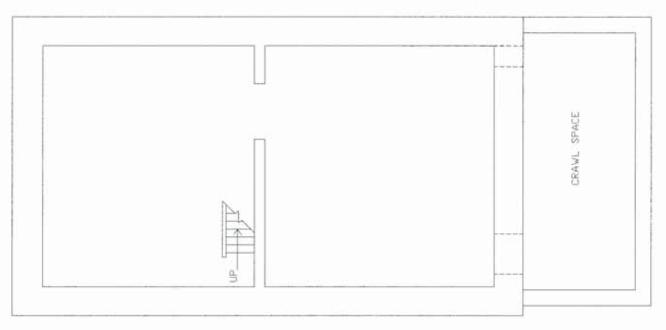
Basement Floor Plan from August 1998 Floor Plan drawings, Sheet A-1 (N.T.S.)
